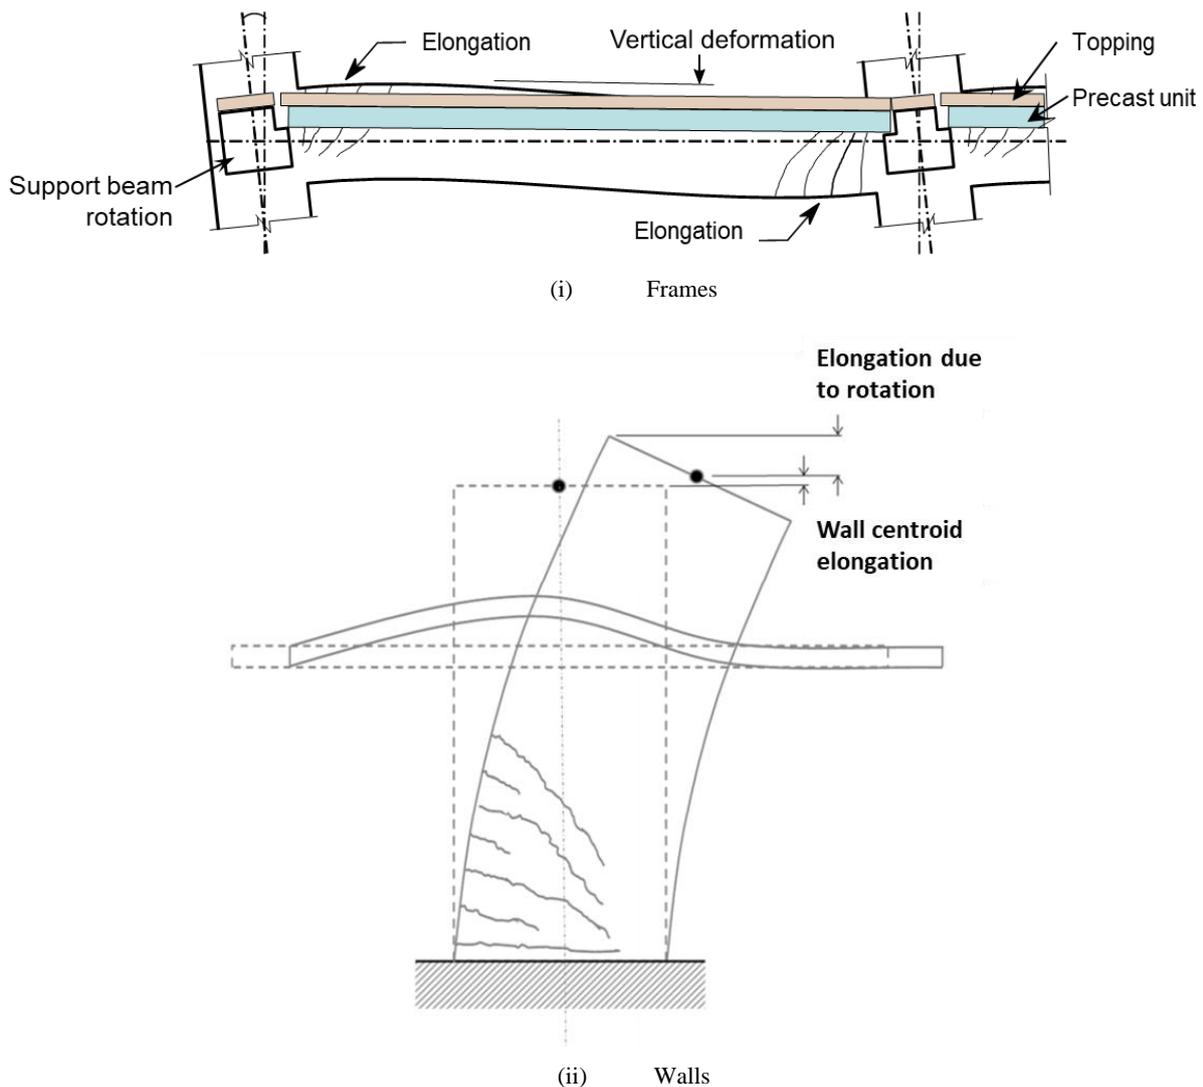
Deformation incompatibility in precast floor systems adjacent to (i)frames and (ii)walls (from [21] and [25]).
